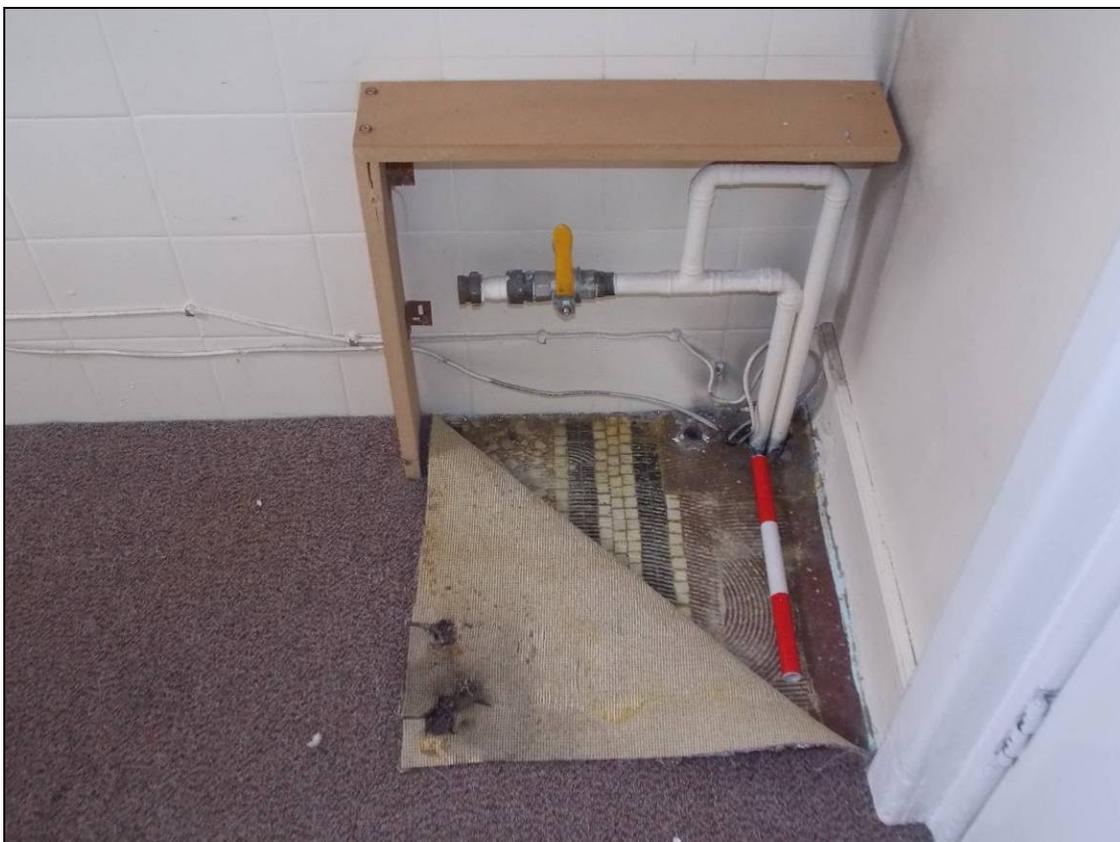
Screed patterned floor with mosaic band, looking north (scale 300mm).
